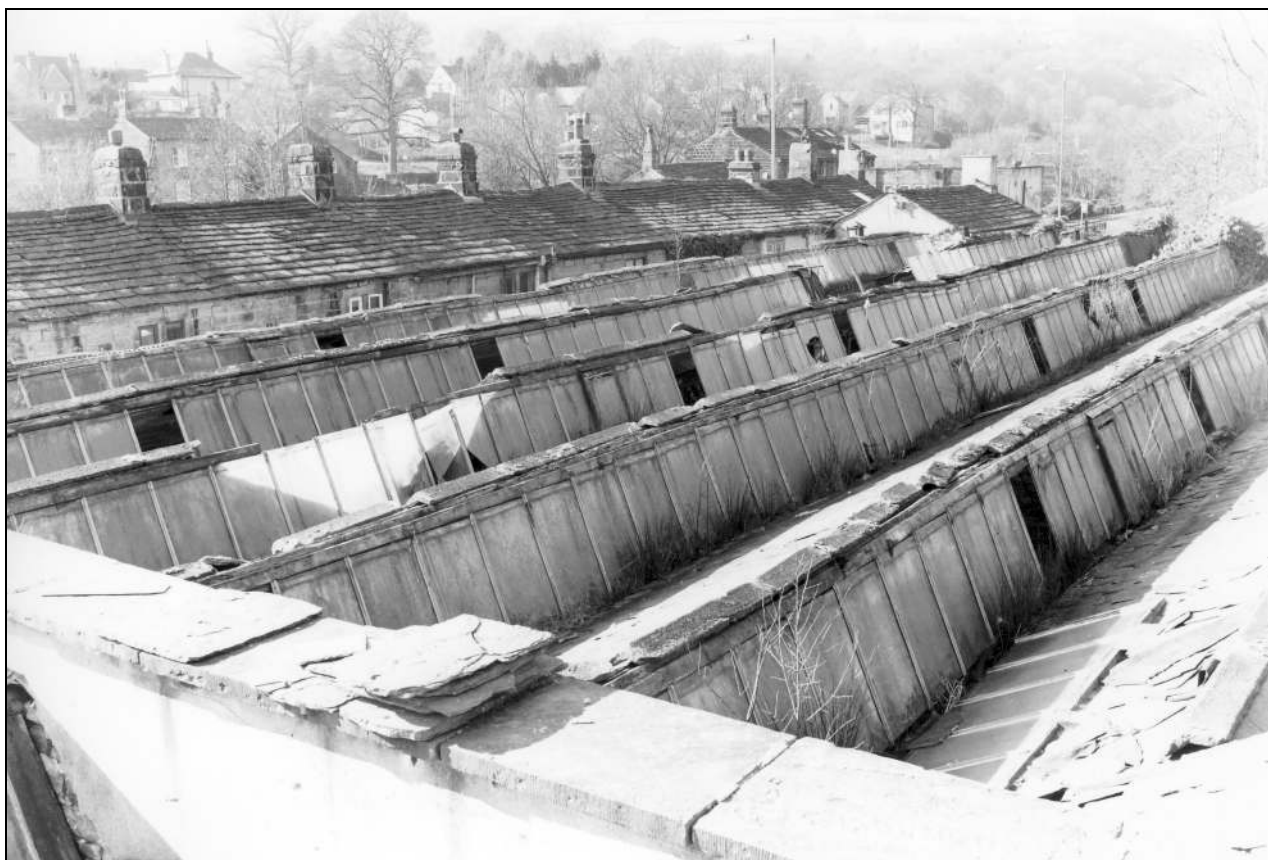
Roof of weaving shed, from the north-east (film 7, frame 12)
